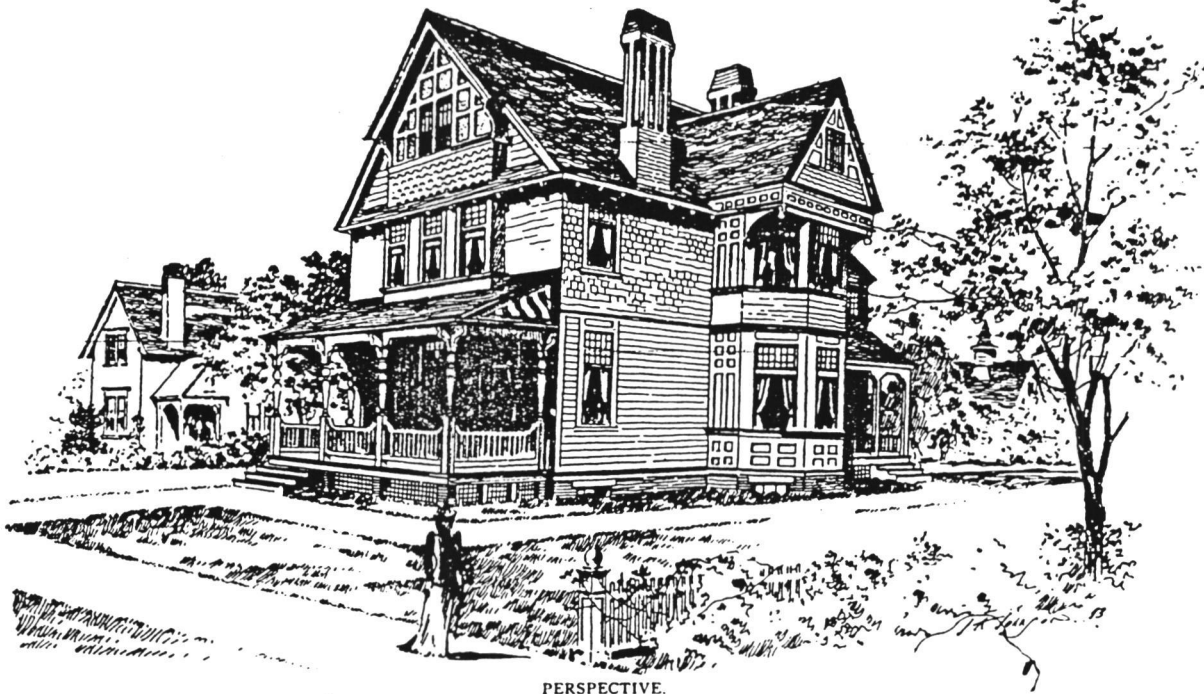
Detail Specimens, Modern Houses, Vol. I, No.2, April 1886.
